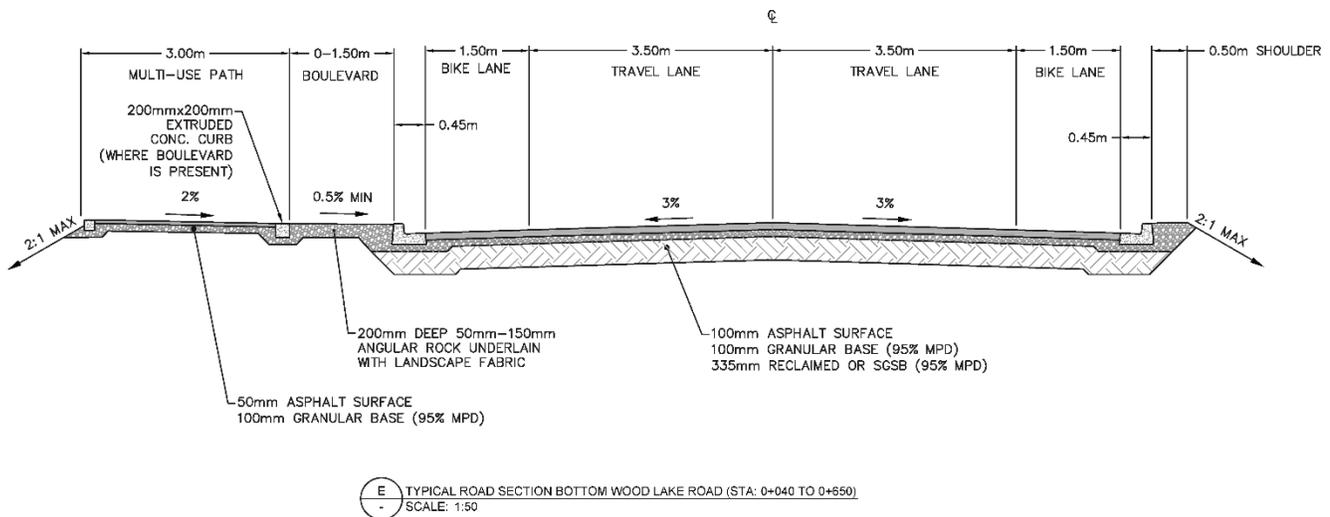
Typical Road Section showing proposed Bottom Wood Lake Road improvements
